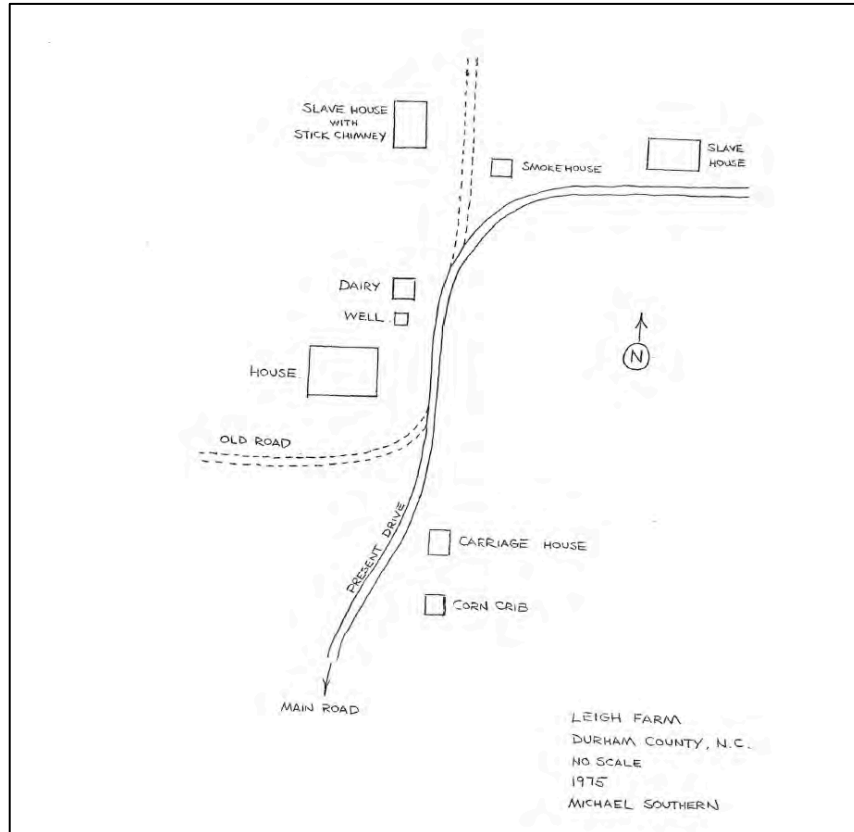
Leigh Farm site plan from 1975 NRHP Nomination form
